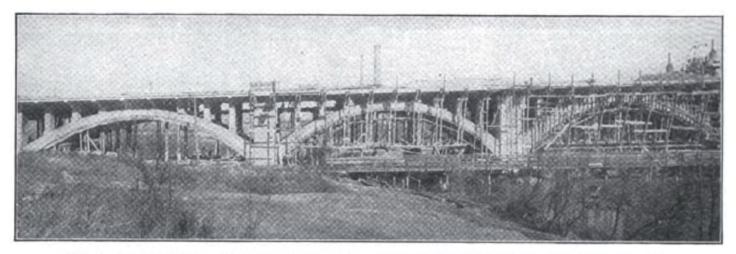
CONSTRUCTION OF MORGAN ST. REINFORCED-CONCRETE BRIDGE AT ROCKFORD, ILL.
